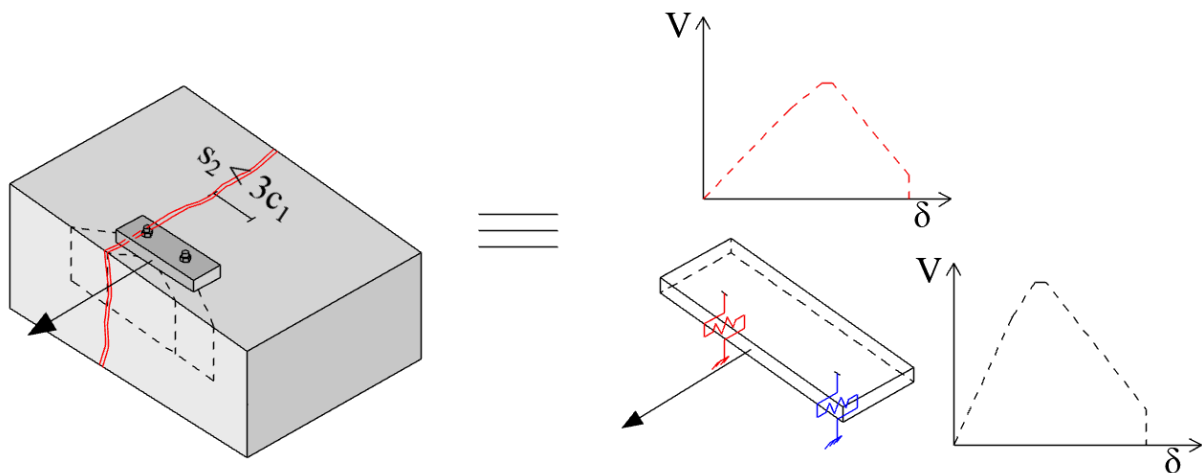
Spring properties for an anchor group of 1×2 configuration with one anchor in crack, one anchor in uncracked concrete
